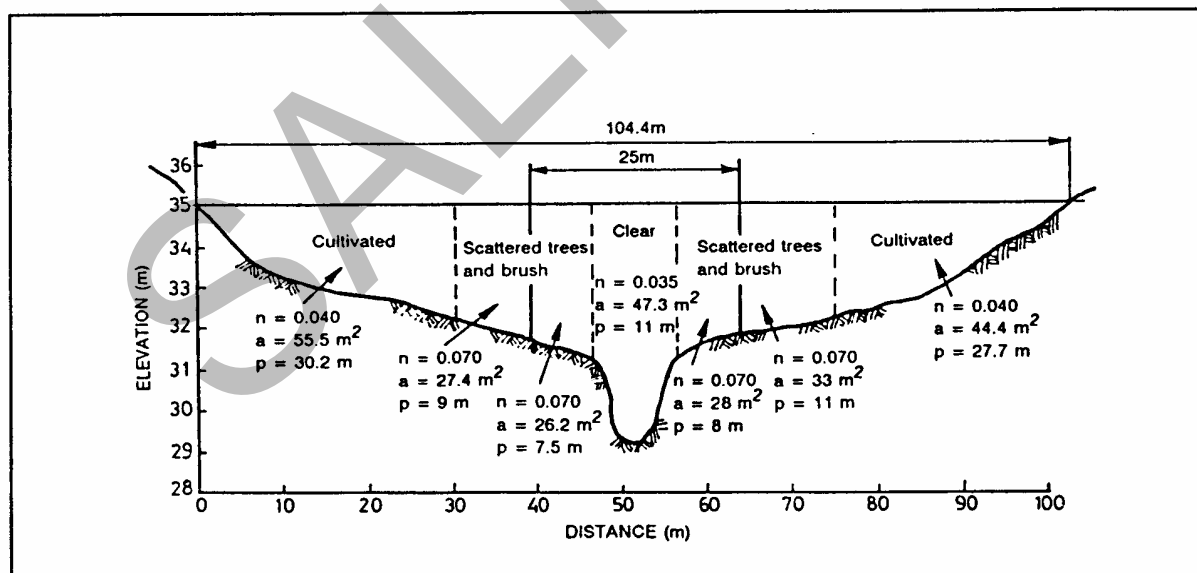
Cross-Section of Stream at Bridge Site (looking upstream)
